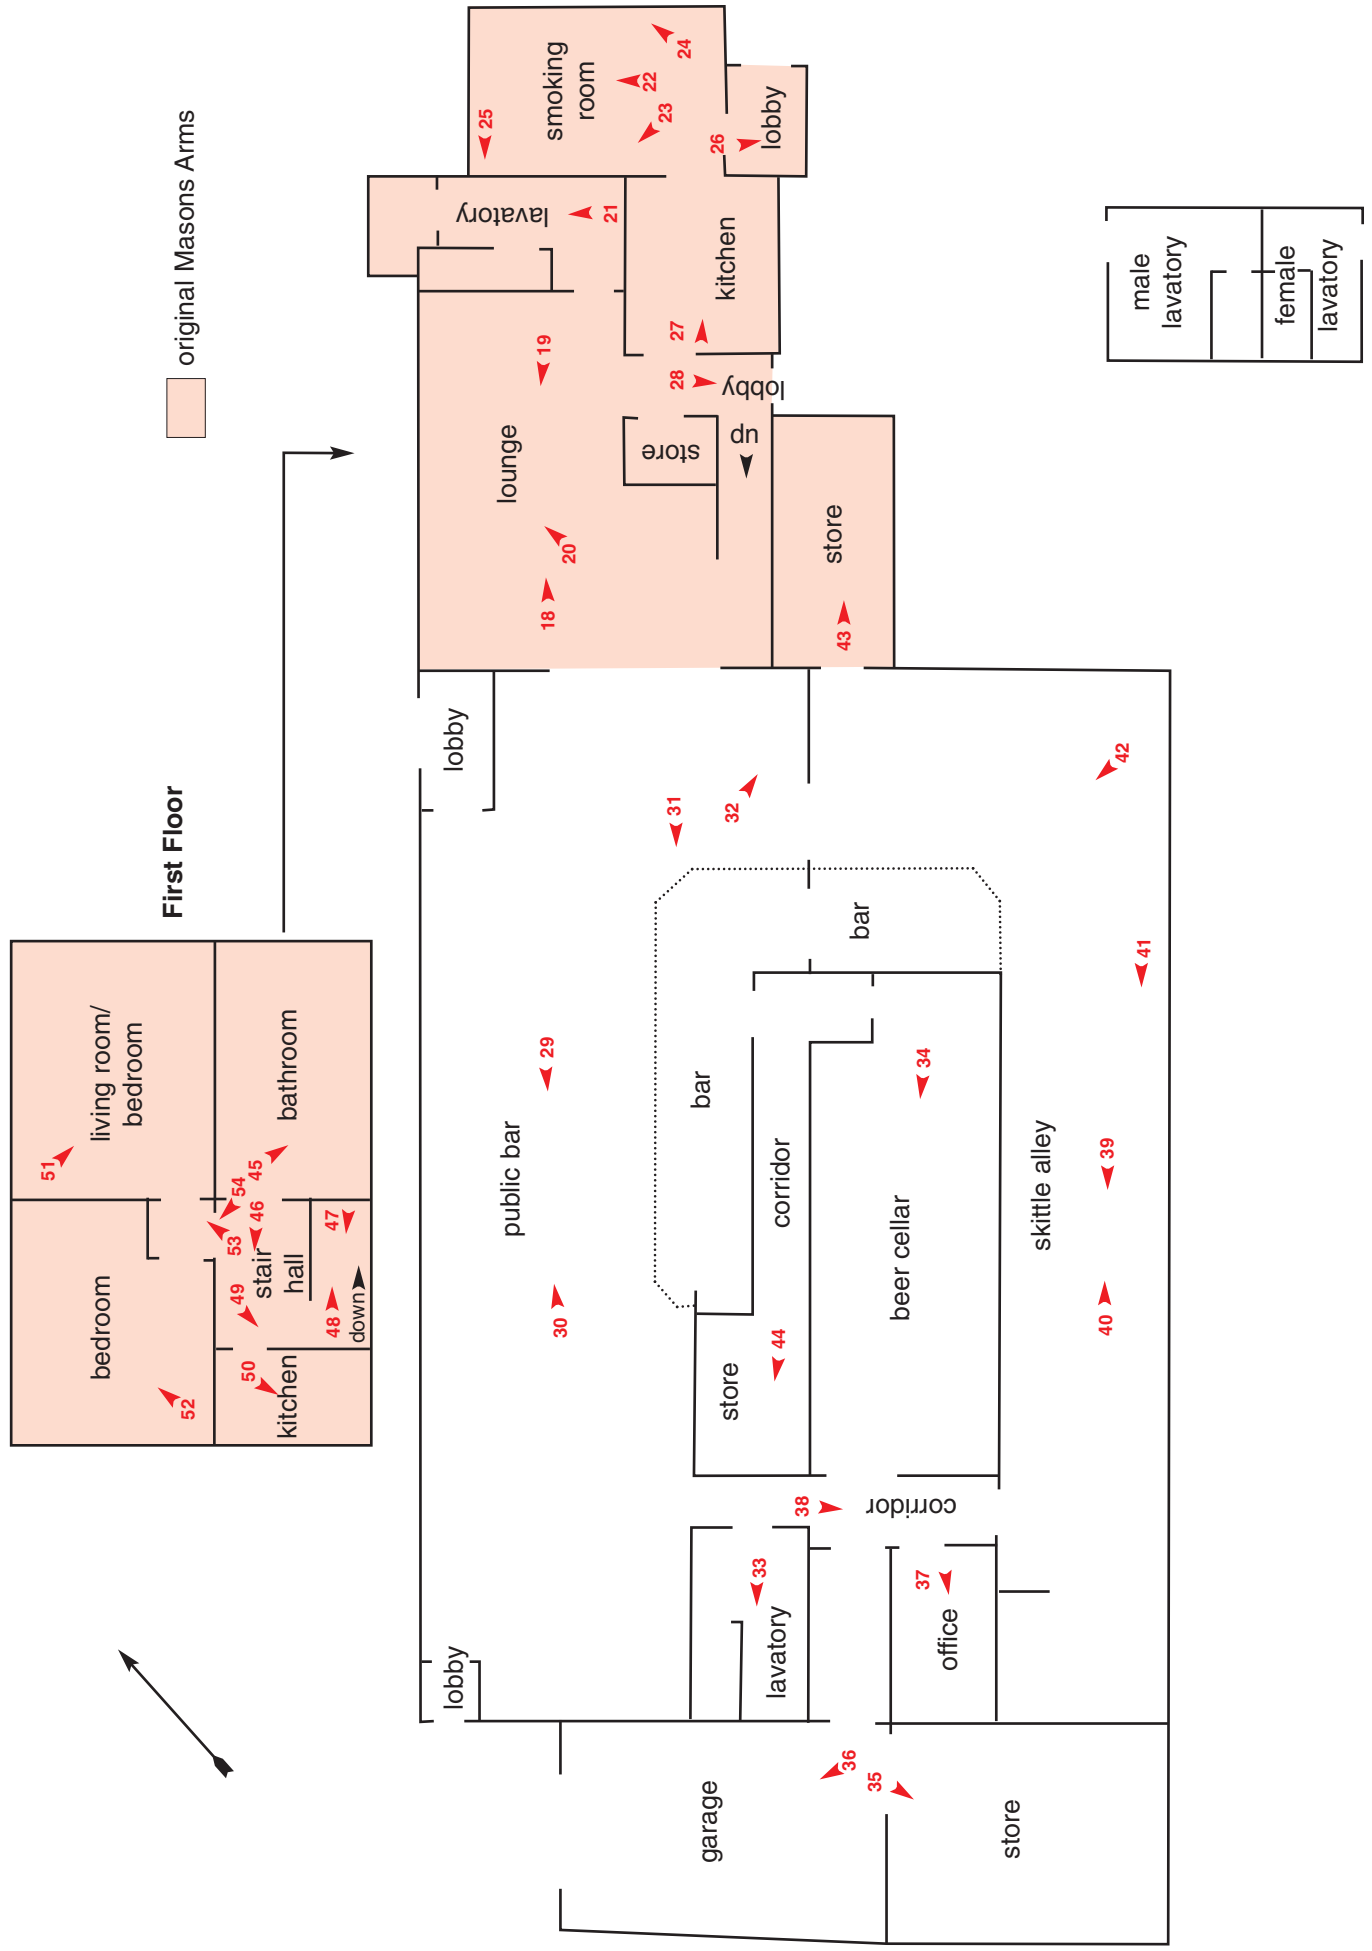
General layout plan of the Masons Arms, with internal plate orientations indicated
